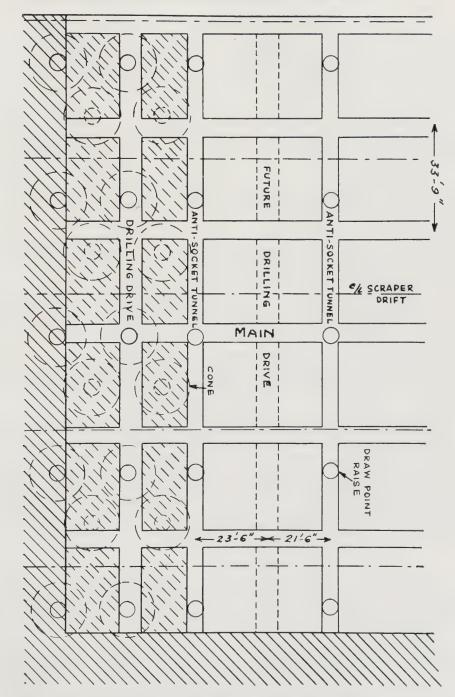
Plan of undercut level prior to a blast. Pillars to be blasted are shown cross-hatched with broken lines
